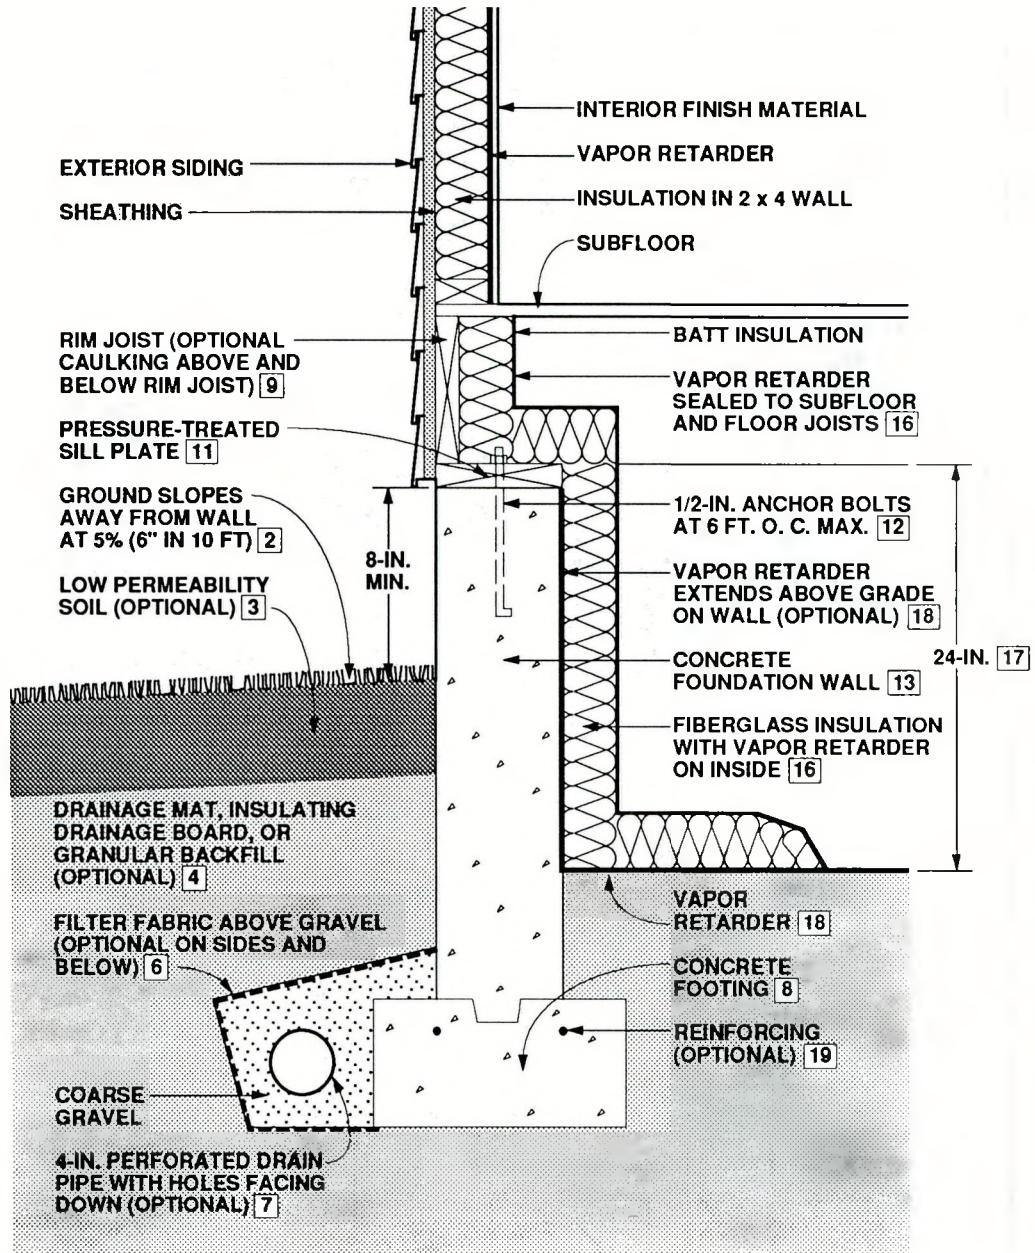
Unvented Crawl Space Wall with Interior Insulation
